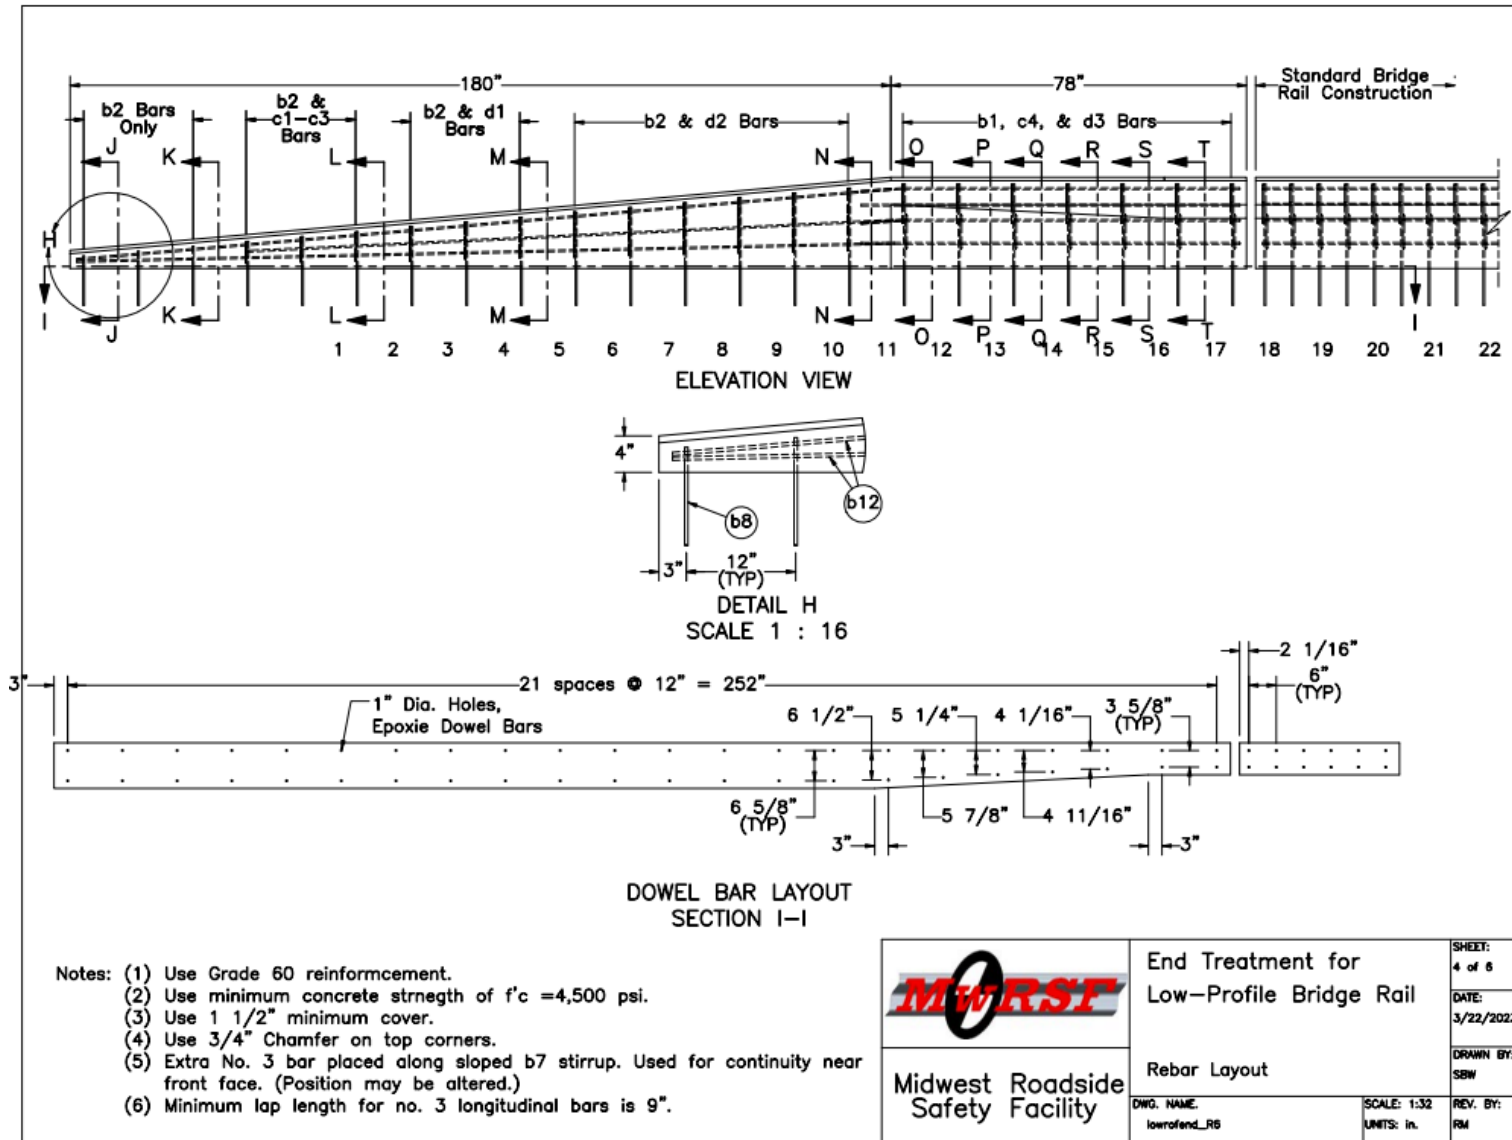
Modified NDOR Bridge Railing System, Rebar Layout
